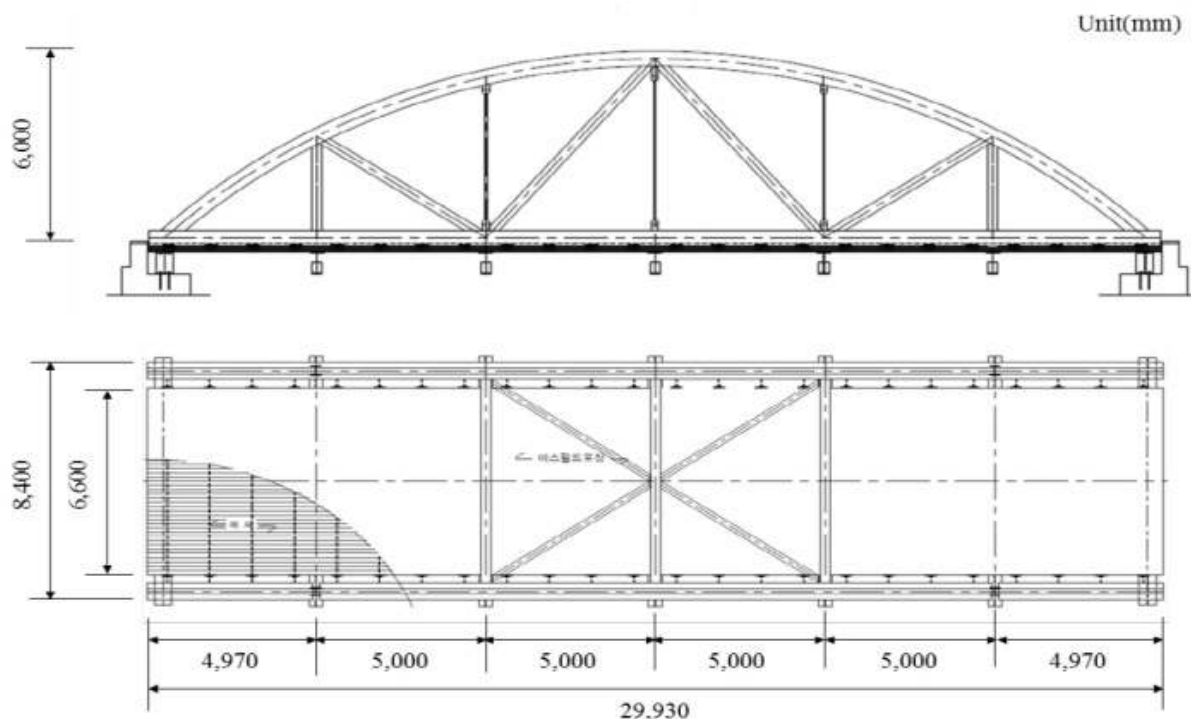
Longitudinal section and floor plan of bridge designed in 2011 (Named Hanareum bridge)
